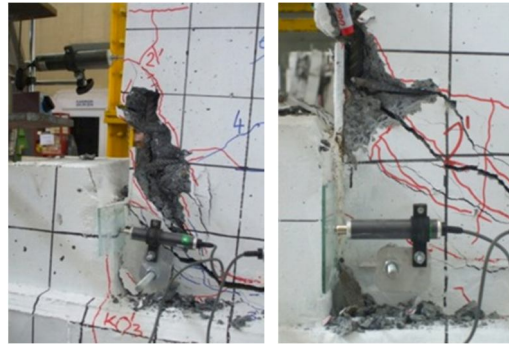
Plastic deformations penetrating into the connection zone and failure of stirrup weldings
